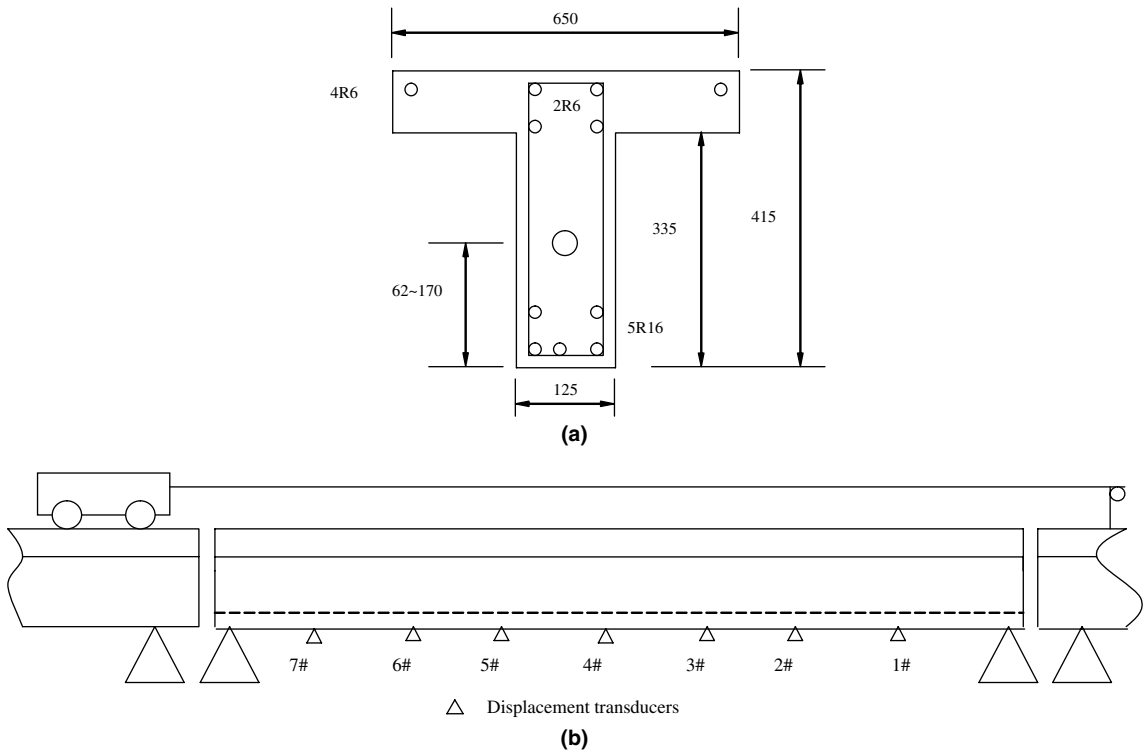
(a) Cross-section layout of the reinforced concrete beam. (b) Experimental setup.
